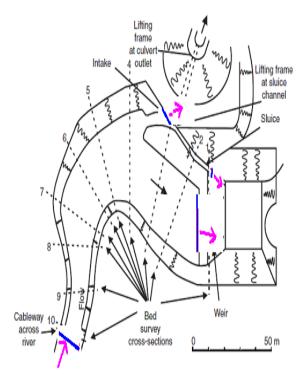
The plan of Kapunga dam and its pond (Ruhther, 2006).
